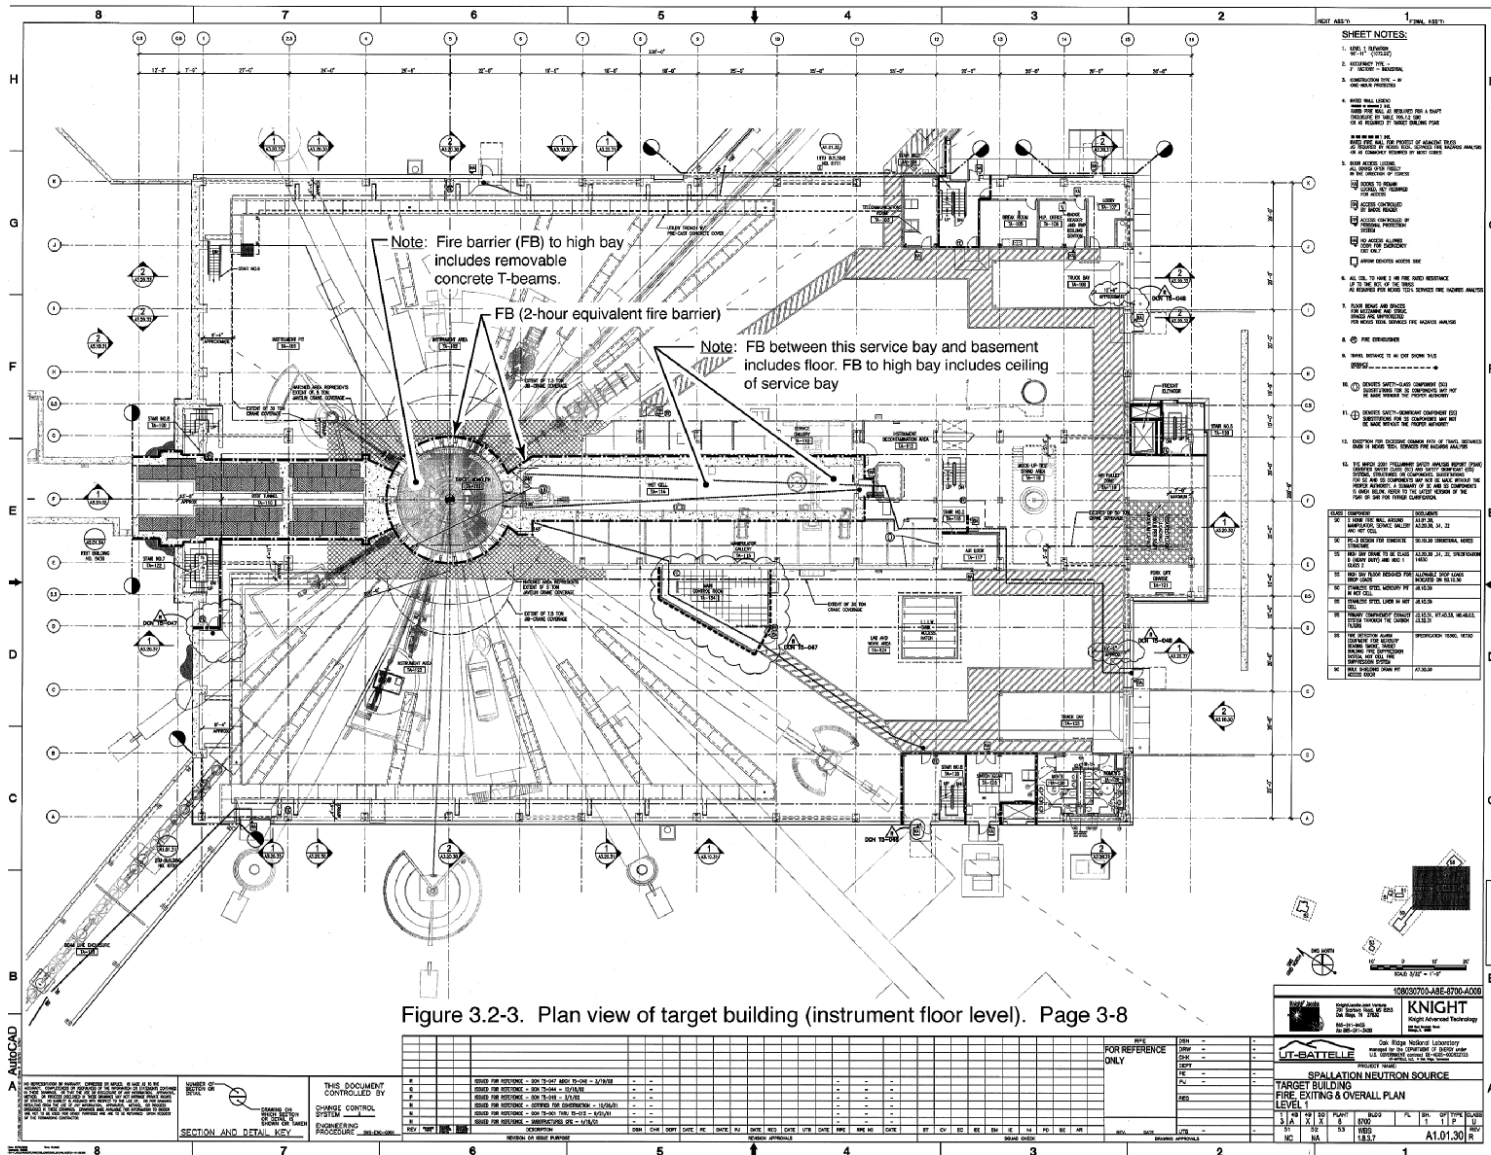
Plan view of target building (instrument floor level). Page 3-8
